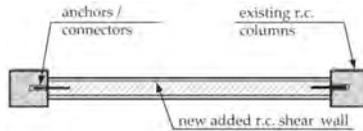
Strengthening solution using new structural walls, as shear walls (adapted after [34]).
